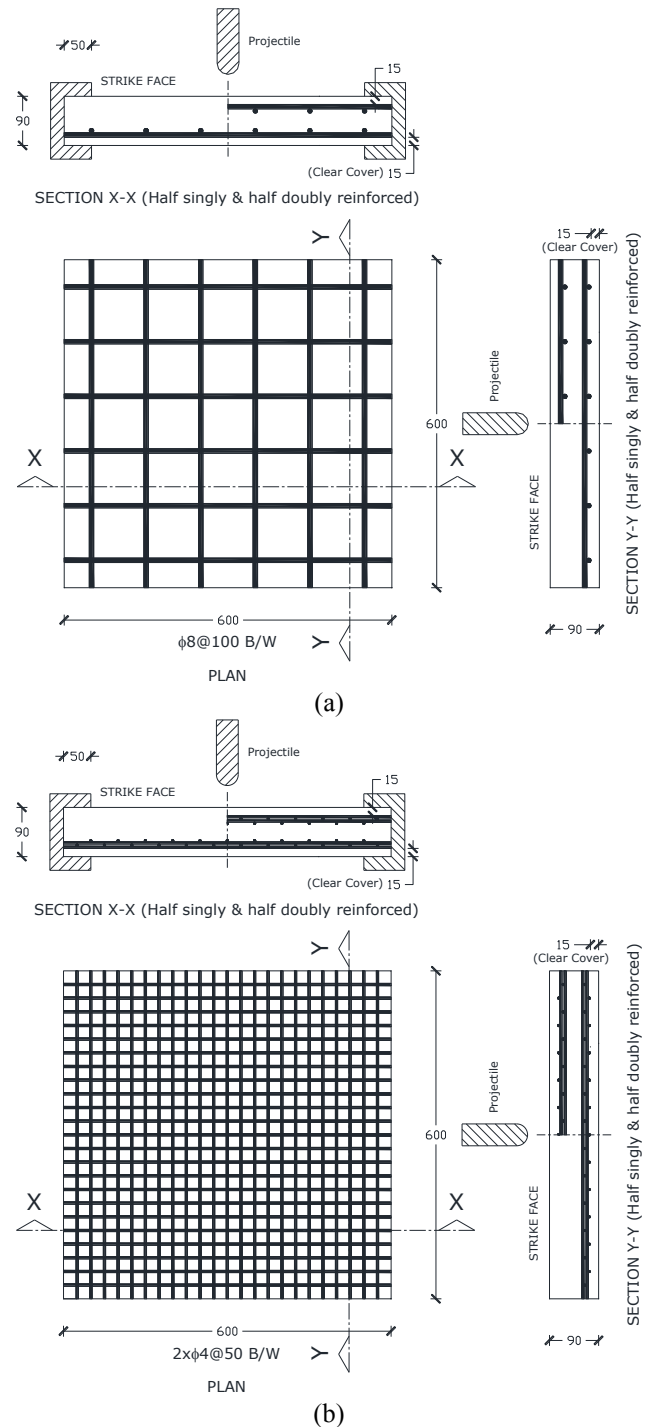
Reinforcement details of test specimens: (a) slab reinforced with 100 mm spaced rebars; (b) slab reinforced with 25 mm spaced rebars (Note: All dimensions are in mm)
